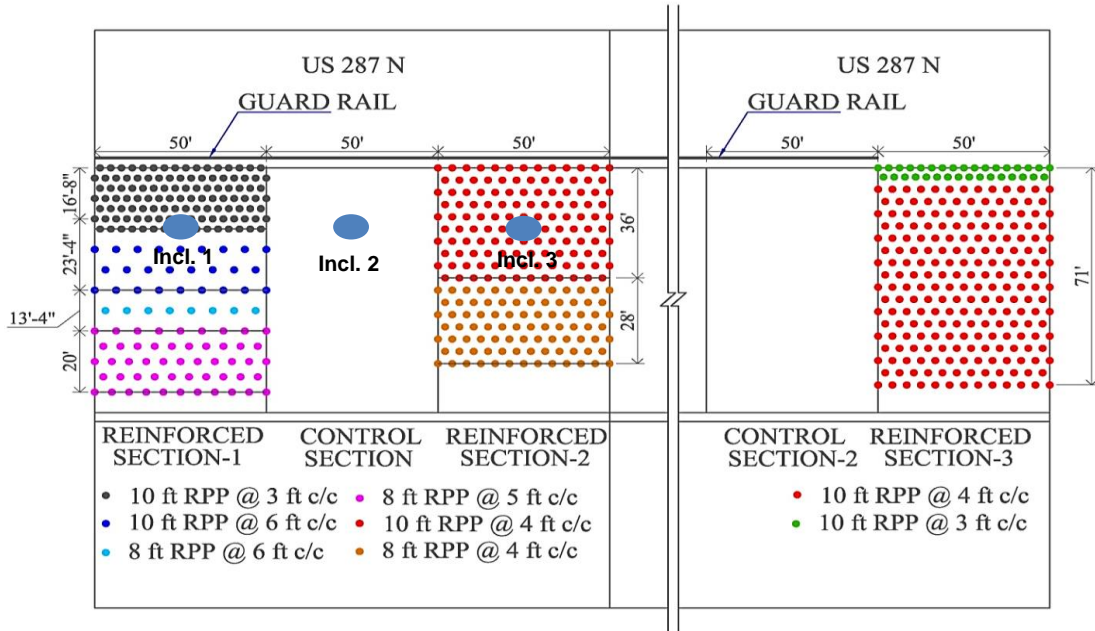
Layout of RPP at US-287 Slope (Khan, 2014)
